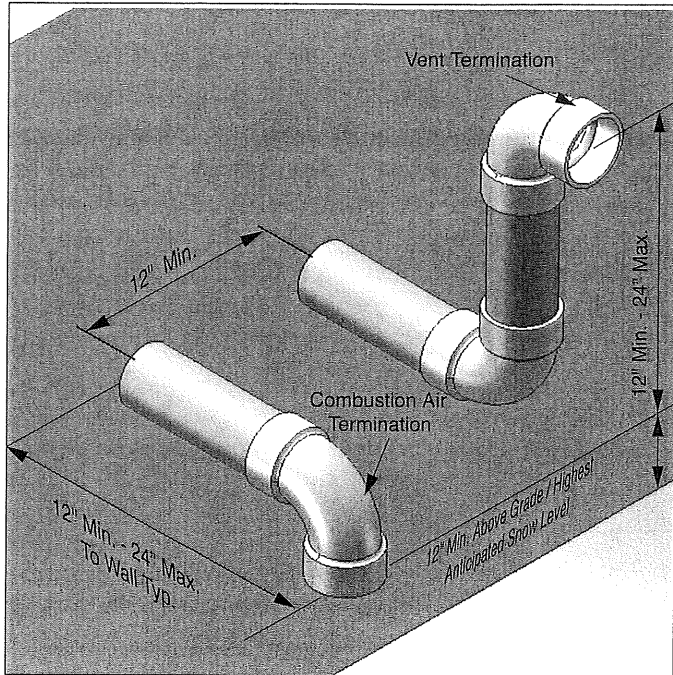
Direct Vent - Sidewall Termination of Vent and Combustion Air Piping
